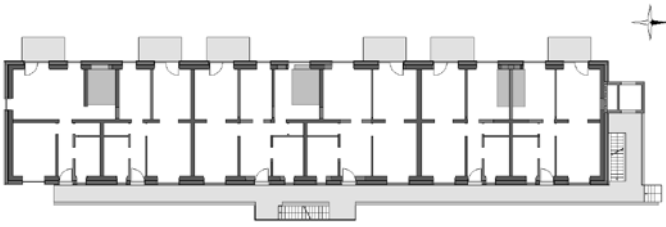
Floor plan of dwelling with existing (dark grey) and new (light grey) parts.
